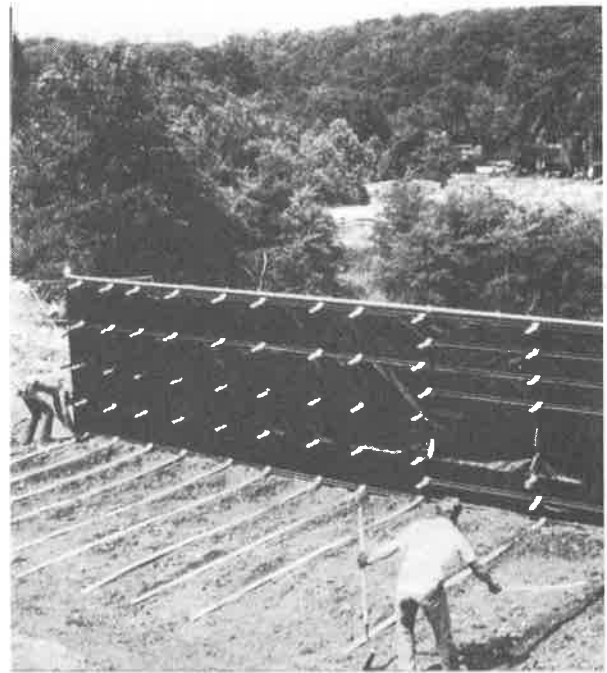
ATTACHING REINFORCING STRIPS, TEST WALL NO. 3
